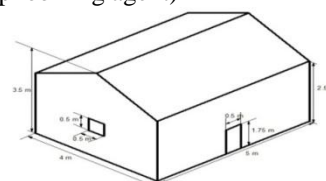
MUD WALL CONSTRUCTION WITH PITCH ROOF STRUCTURE
